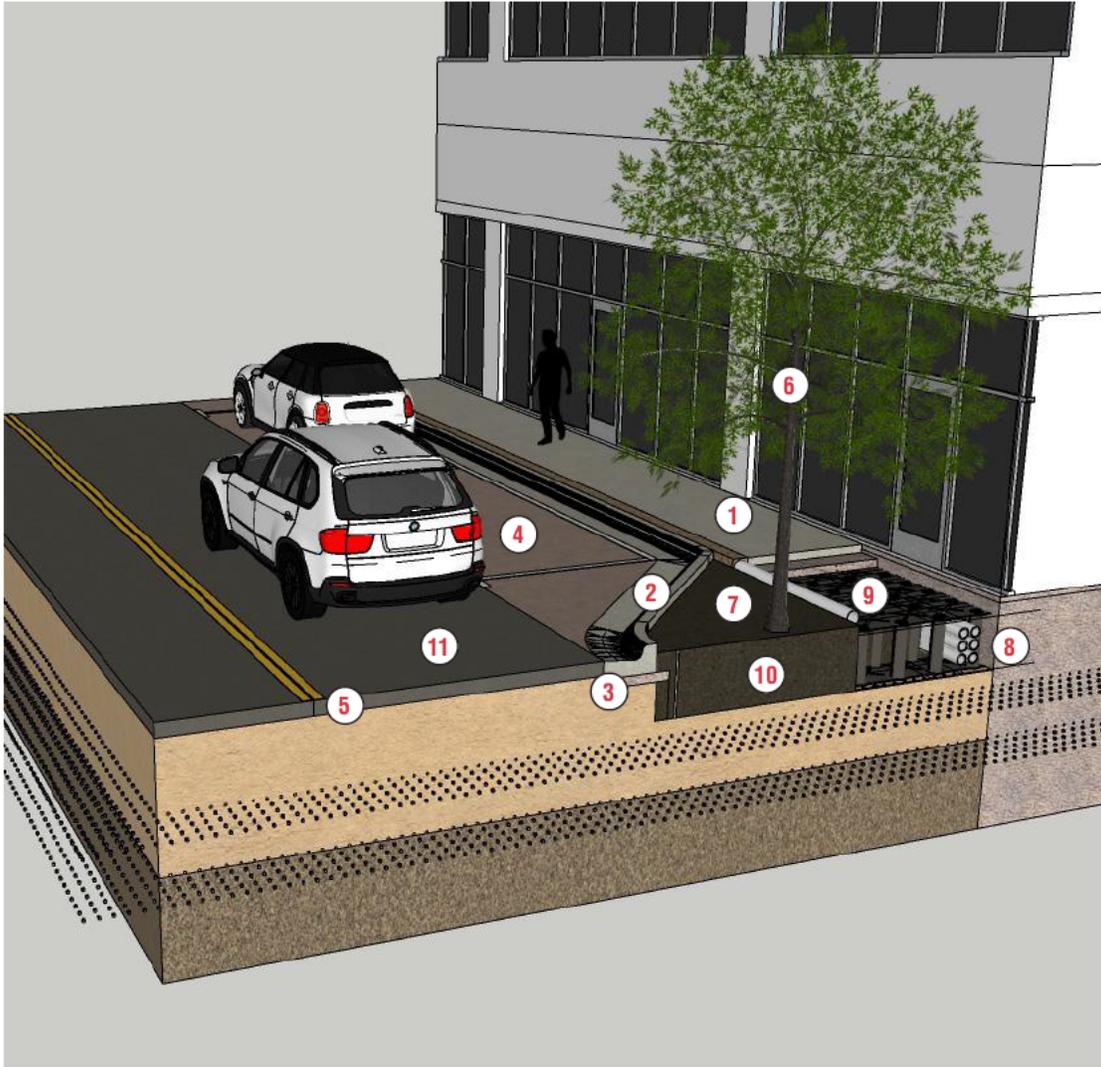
Methods for planting on all street frontages as per the Urban Forestry Master Plan adopted in 2020.
